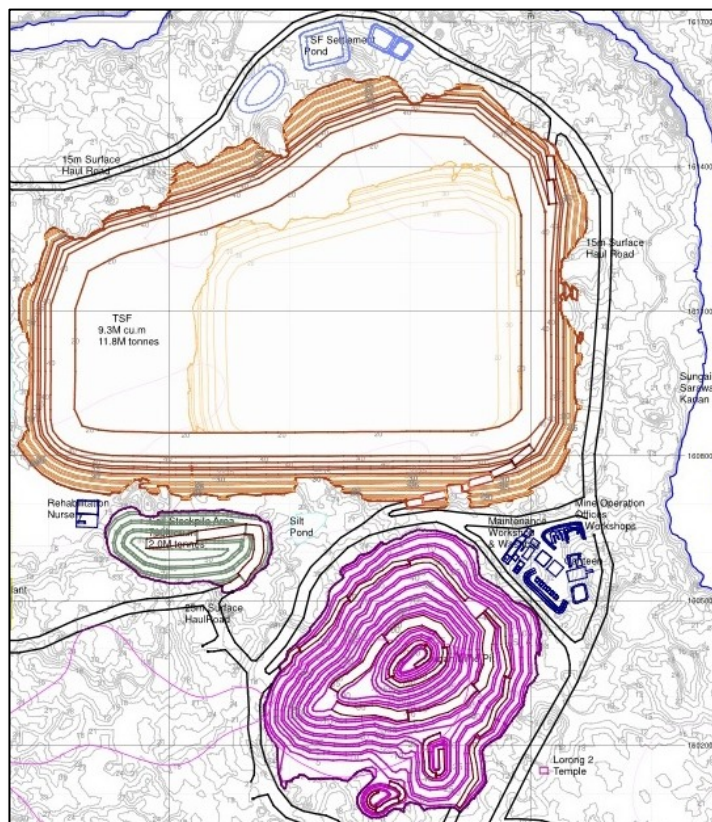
Proposed Jugan Tailings Impoundment Design in Relation to Pit
